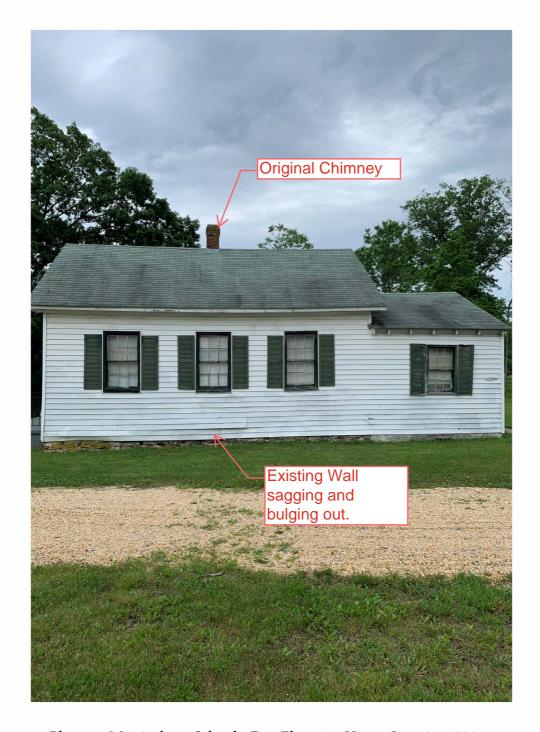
Martinsburg School - East Elevation View - June 24, 2020
